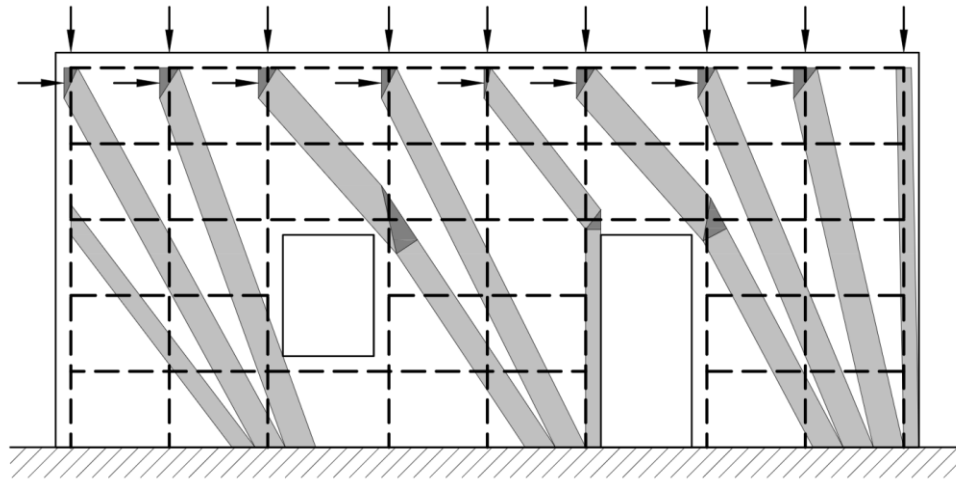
Varied Masonry Compression Strut Angles (Dillon, 2015)
